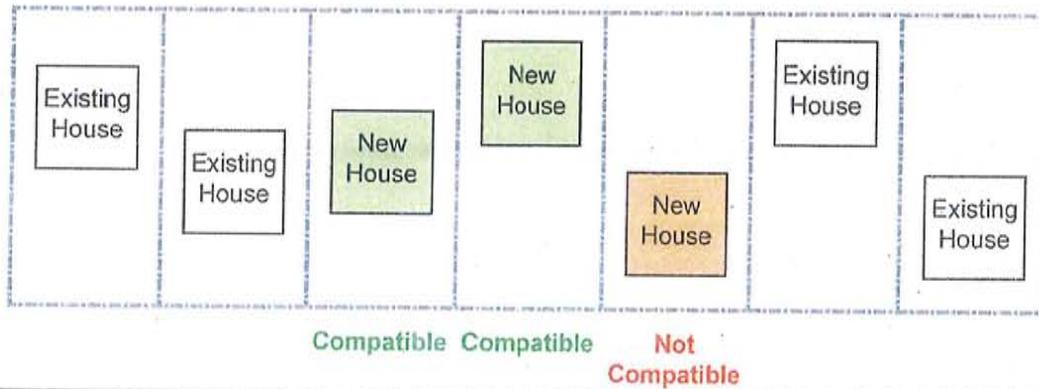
In neighborhoods where existing homes have varied setbacks, the siting of new construction should be equal to or greater than the average setback of adjacent homes.
